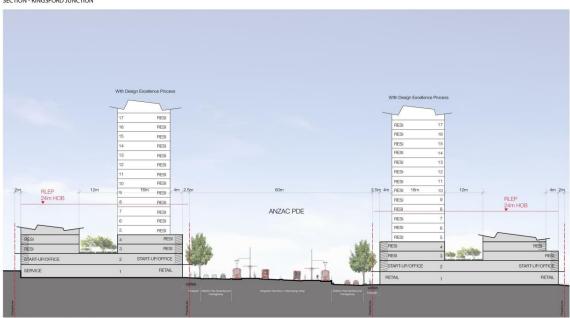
Section of Kingsford Junction showing 17 storey building typology with 4 storey street wall and mews development at the rear.
